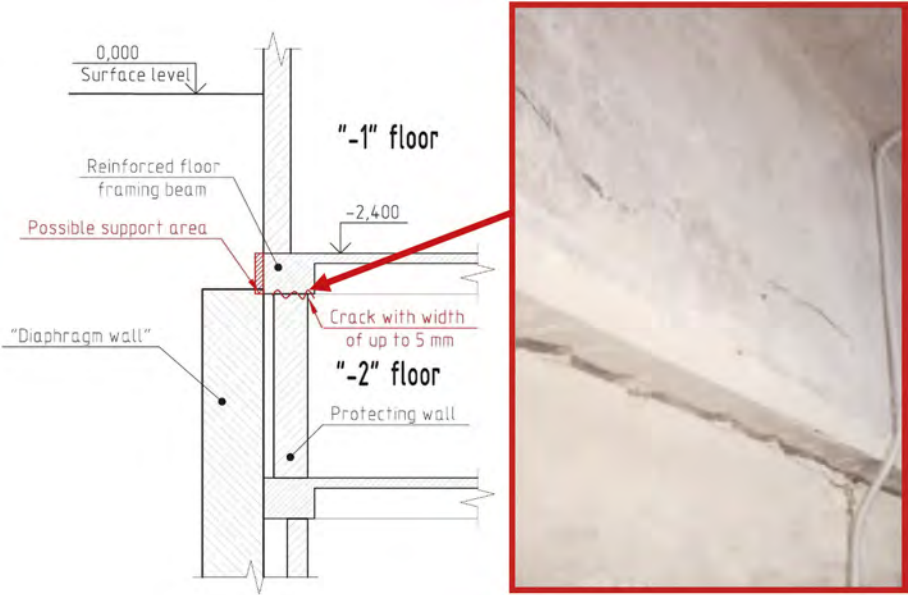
The crack observed in the 2-nd floor framing beam to A’- directional protective wall joint.
